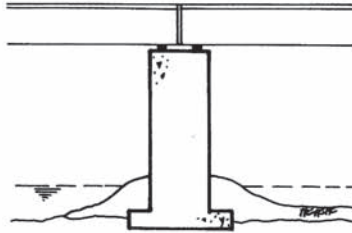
CONCRETE PIER ON SPREAD FOUNDATION
